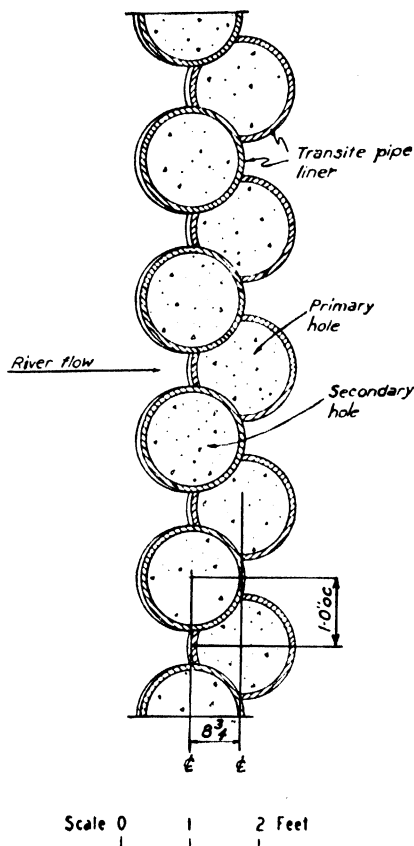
Plan of 18-inch holes (after Schmidt)
